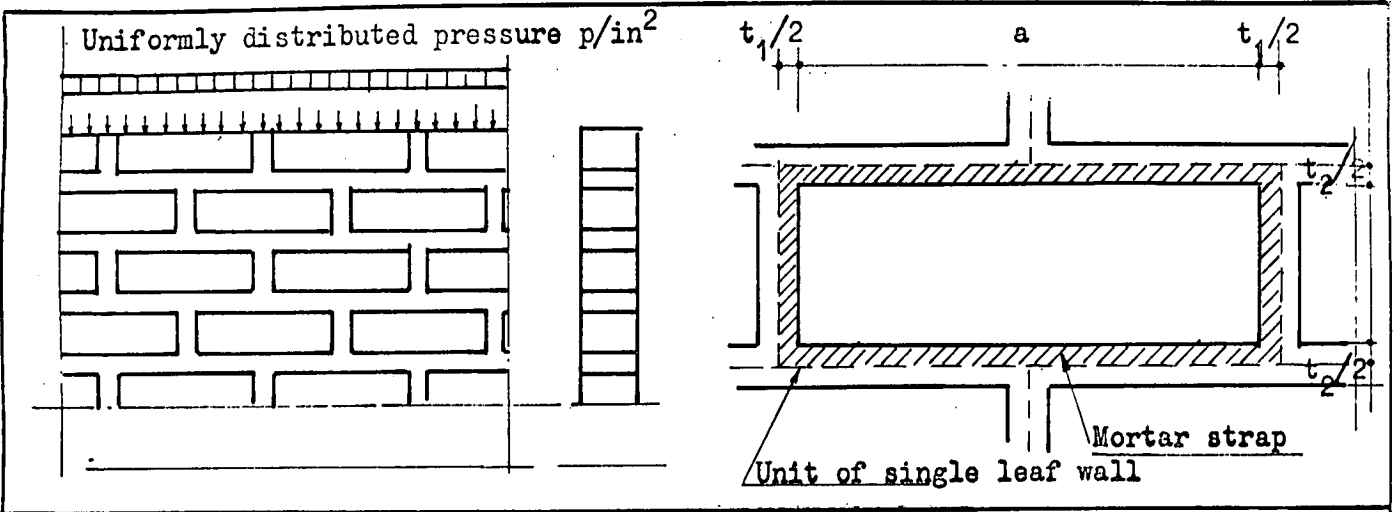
A single leaf wall brick masonry wall and the simplest unit
